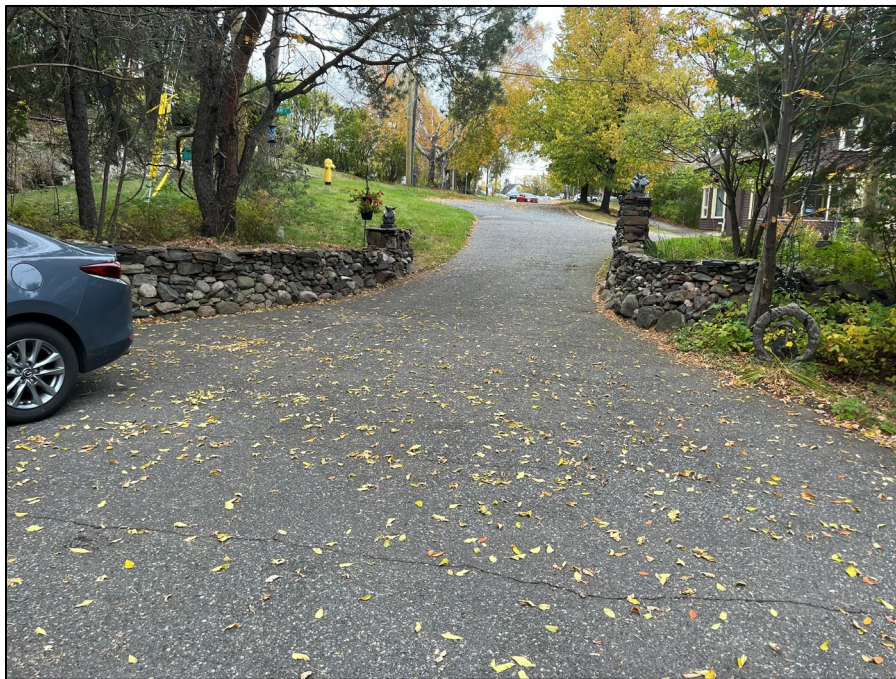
West elevation, looking north (Egis, October 16, 2025).
